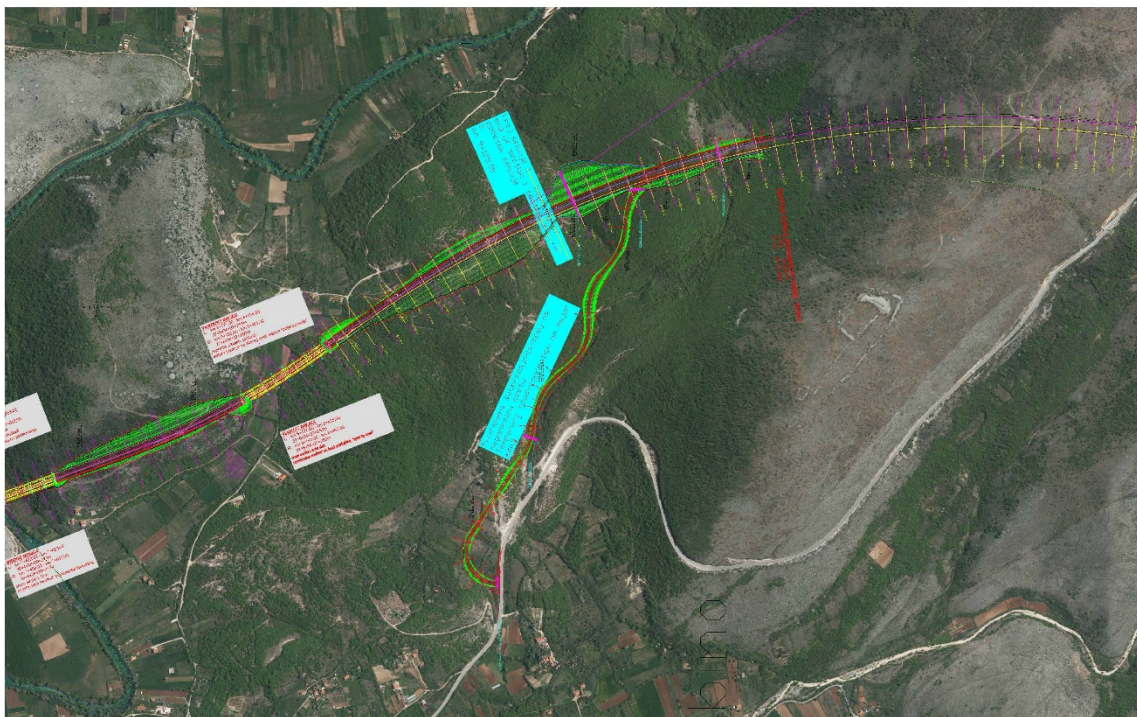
Part of the section passing through a tunnel and crossing the Bunica River before entering into Tunnel Kvanj in Hodbina
